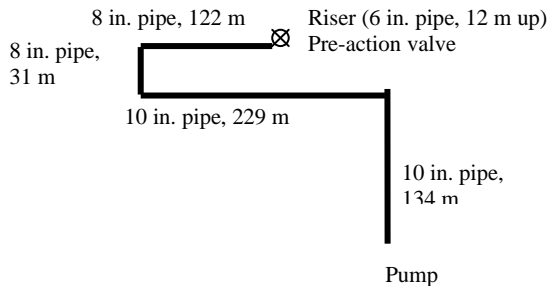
Sketch of the feed-main pipe section of the dry-pipe sprinkler system.
